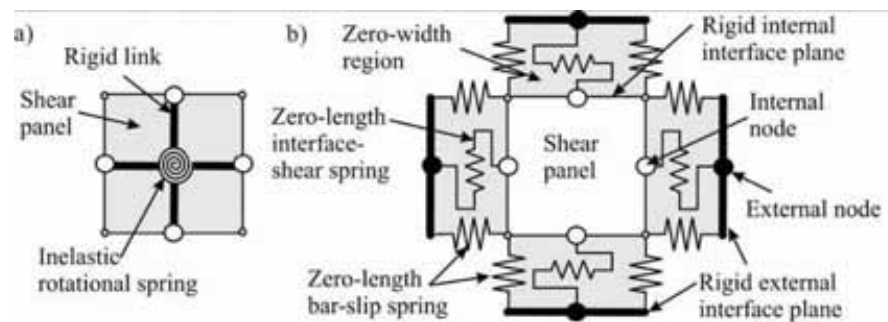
a) Single rotational spring joint model [2, 111]; b) Multi-spring macro joint model [86].
